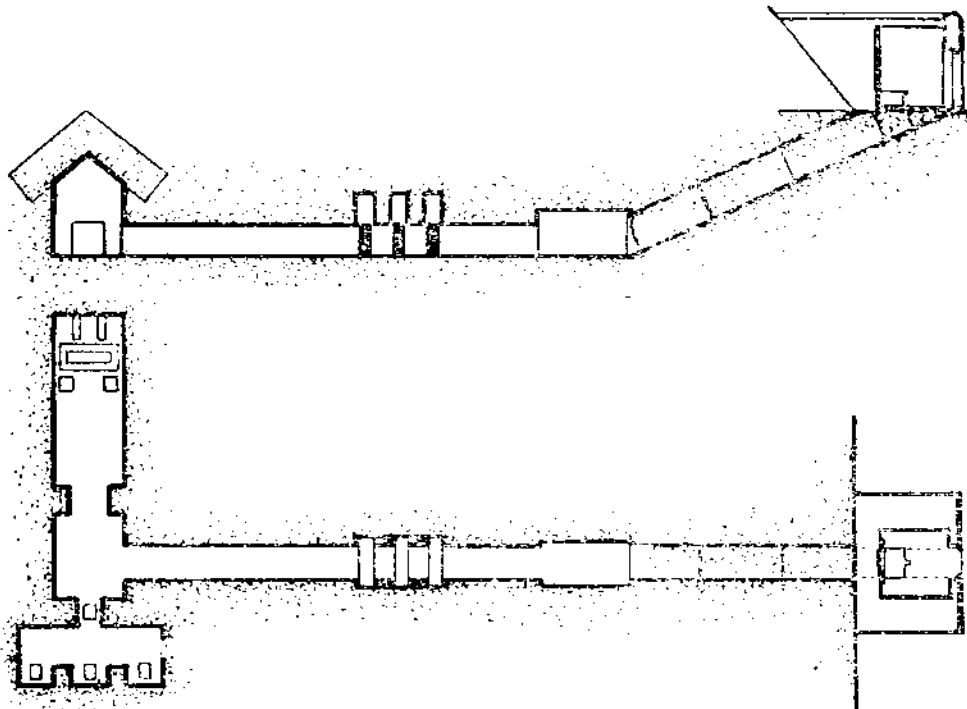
Section and plan of the funeral apartment in Unas' pyramid.
